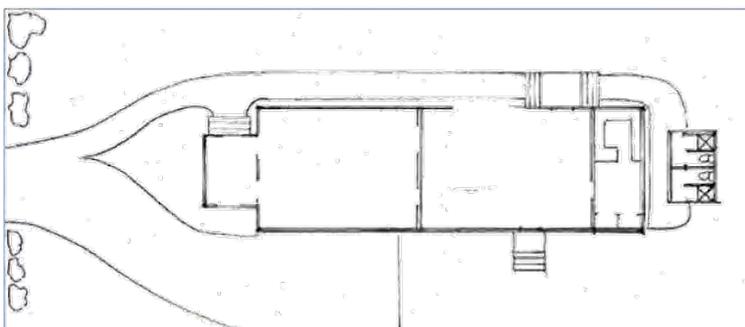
Site Plan (Extract from Attachment B – Plan)
